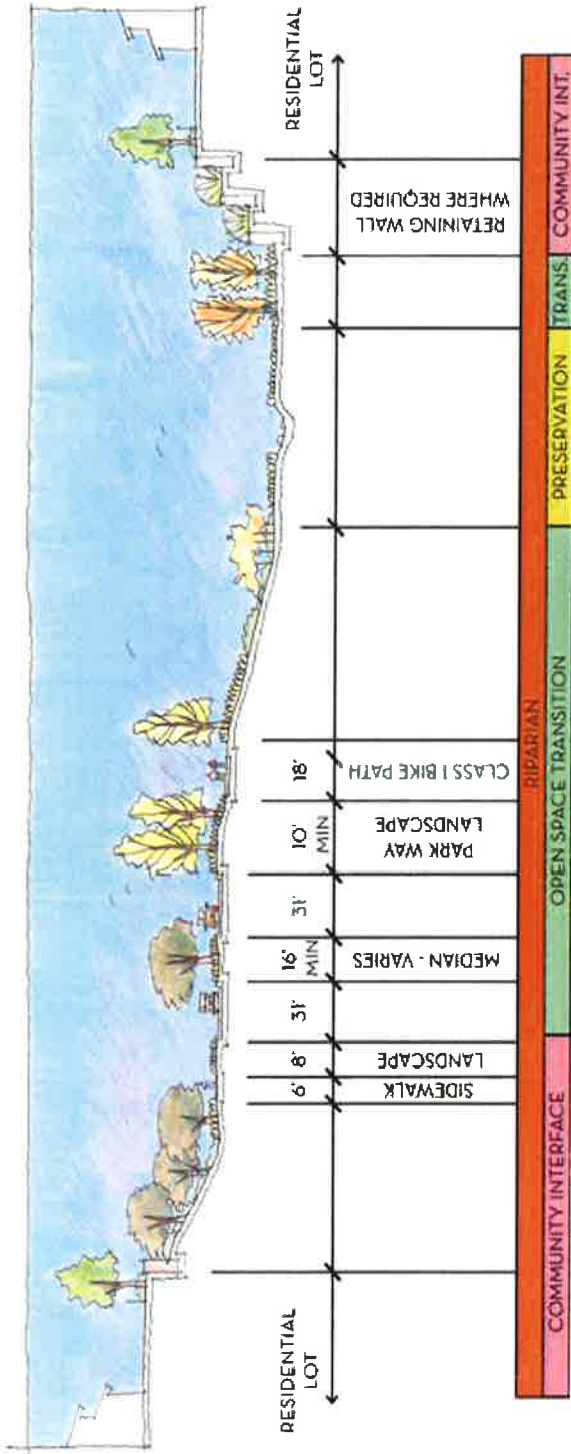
Empire Ranch Road 4 Lane Road Landscape
